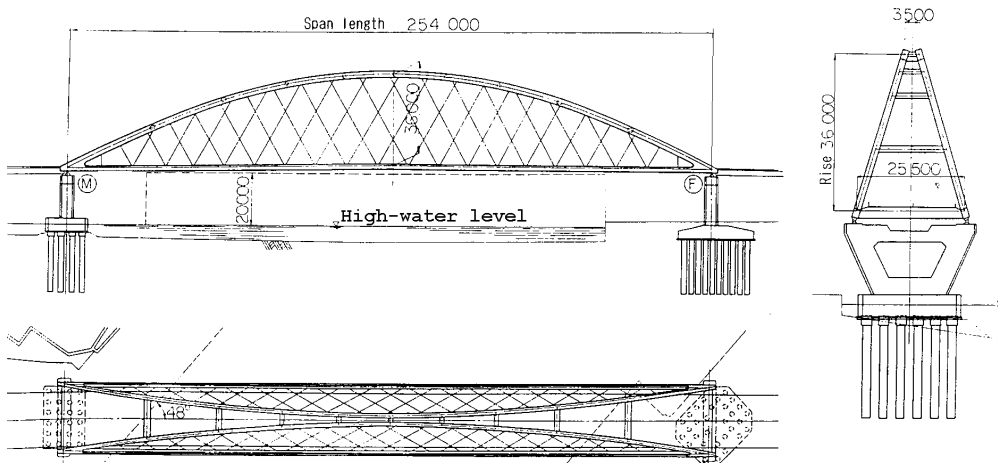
The Shinhamadera Bridge built in Japan in 1991.
